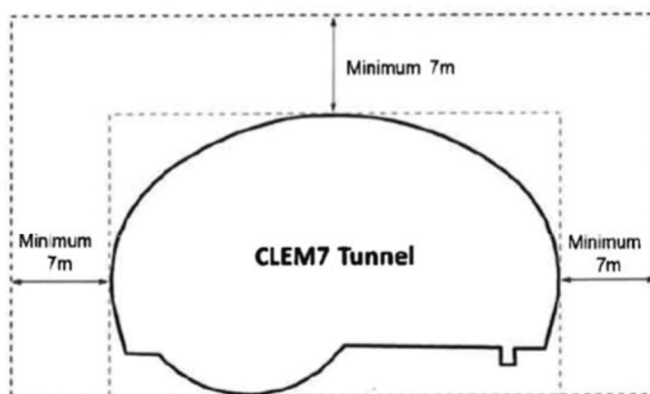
CLEM7 Tunnel Extrados Excavation Exclusion Zone Planning Requirements
